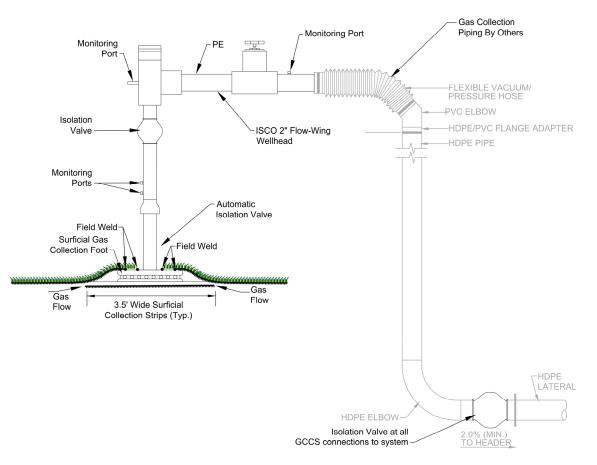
ClosureTurf® Surficial Collection Foot Connection to GCCS System
